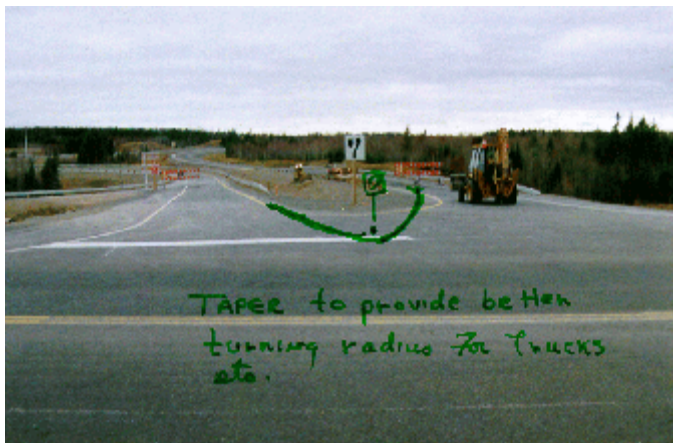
Bullnose separating Route 25 north on and off-ramps.
